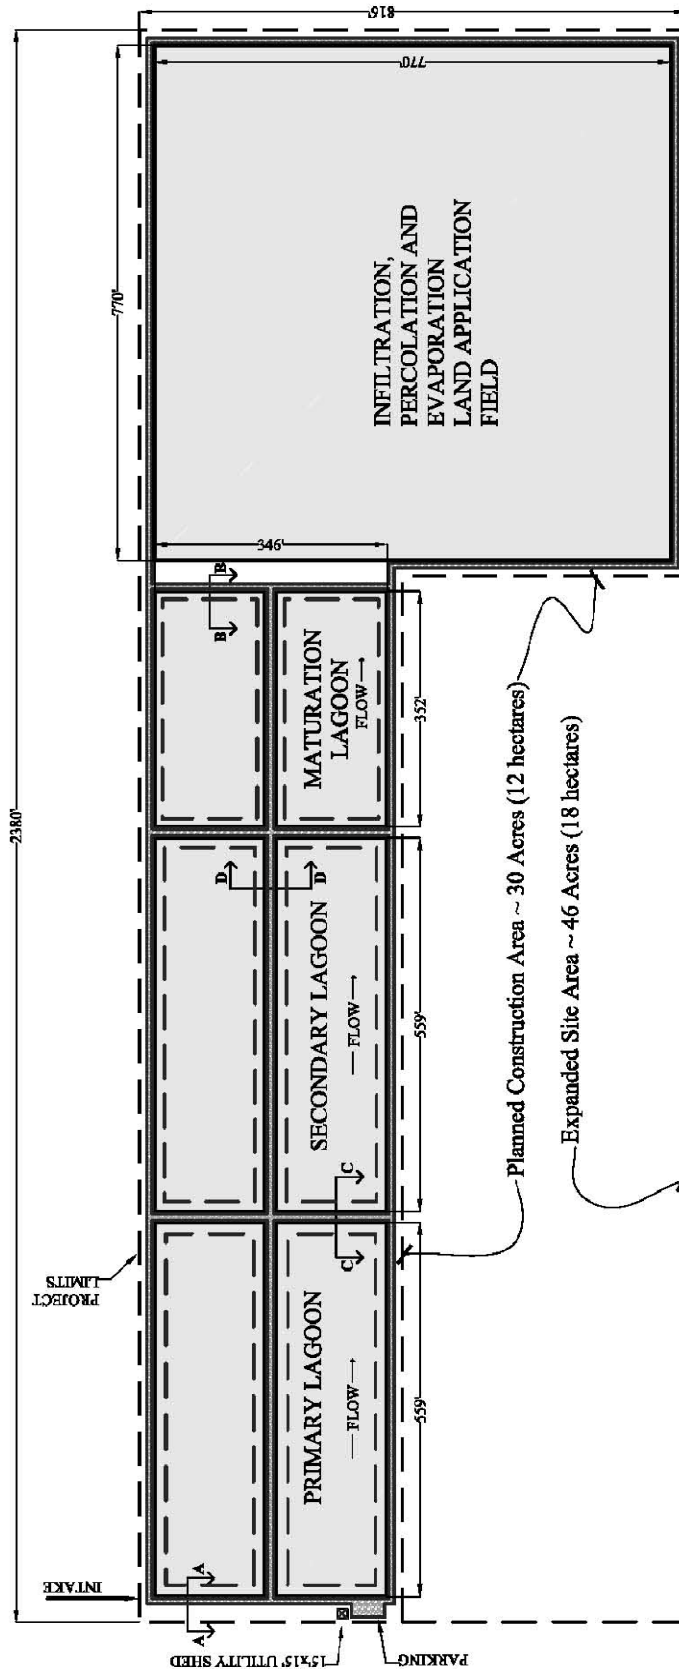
Facultative Lagoon System Schematic Site Plan
